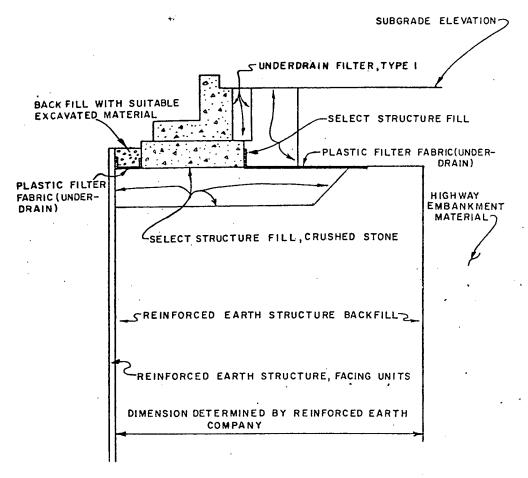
Typical Reinforced Earth abutment design (New York State DOT).
